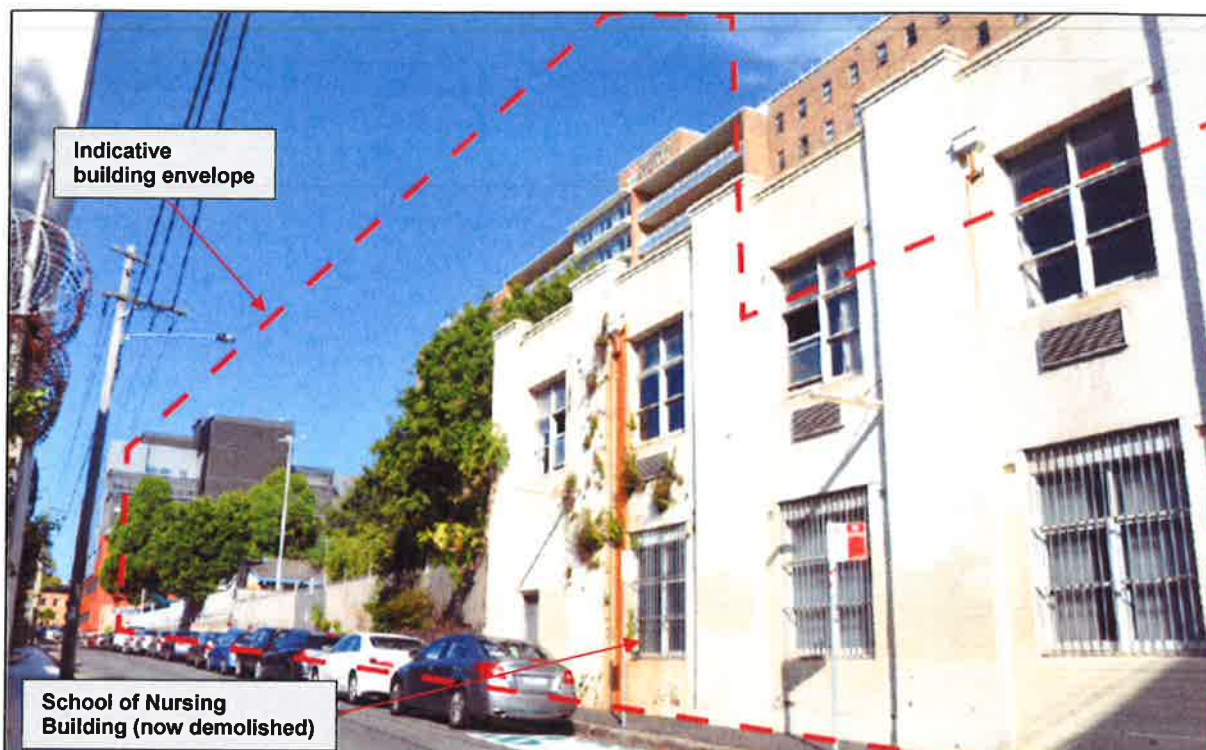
Indicative building envelope, viewed from Church Street looking east (source: EIS)
